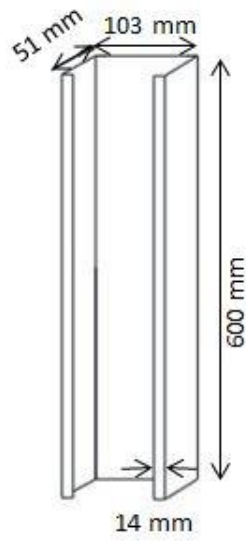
Schematic drawing for cold-formed steel with section 103 mm
